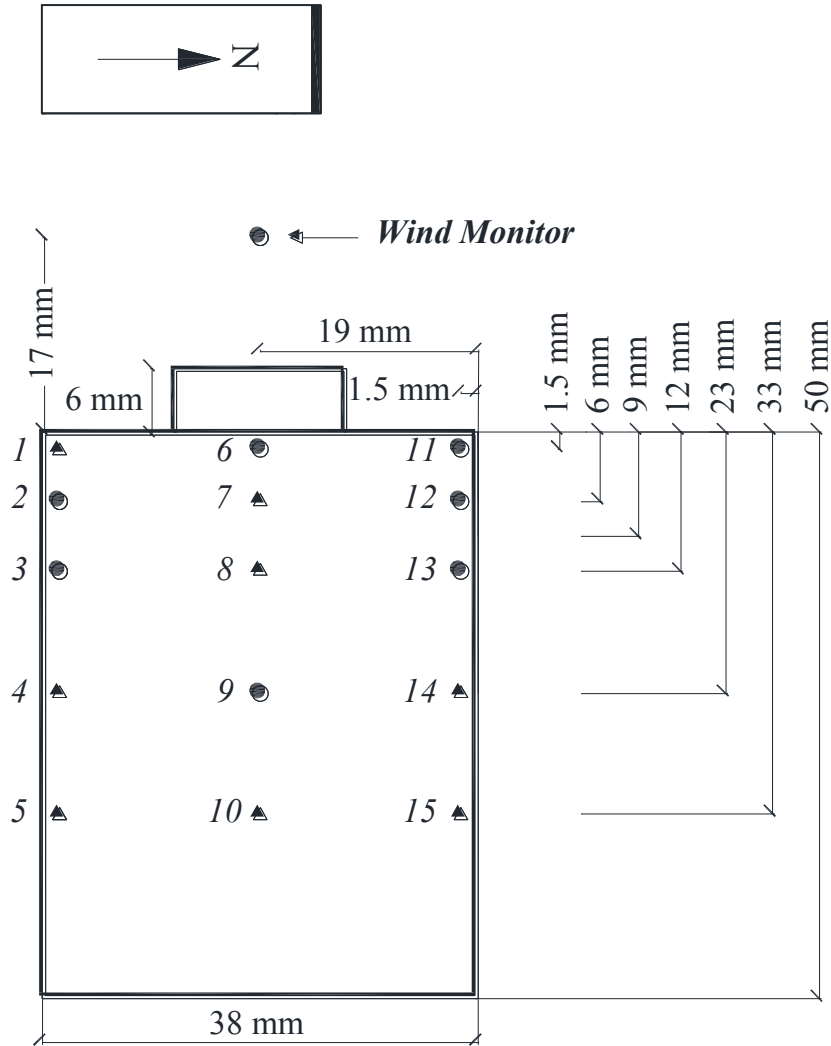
Side view of the north facade of the test building model with the location of wind monitor and facade measurement points.
